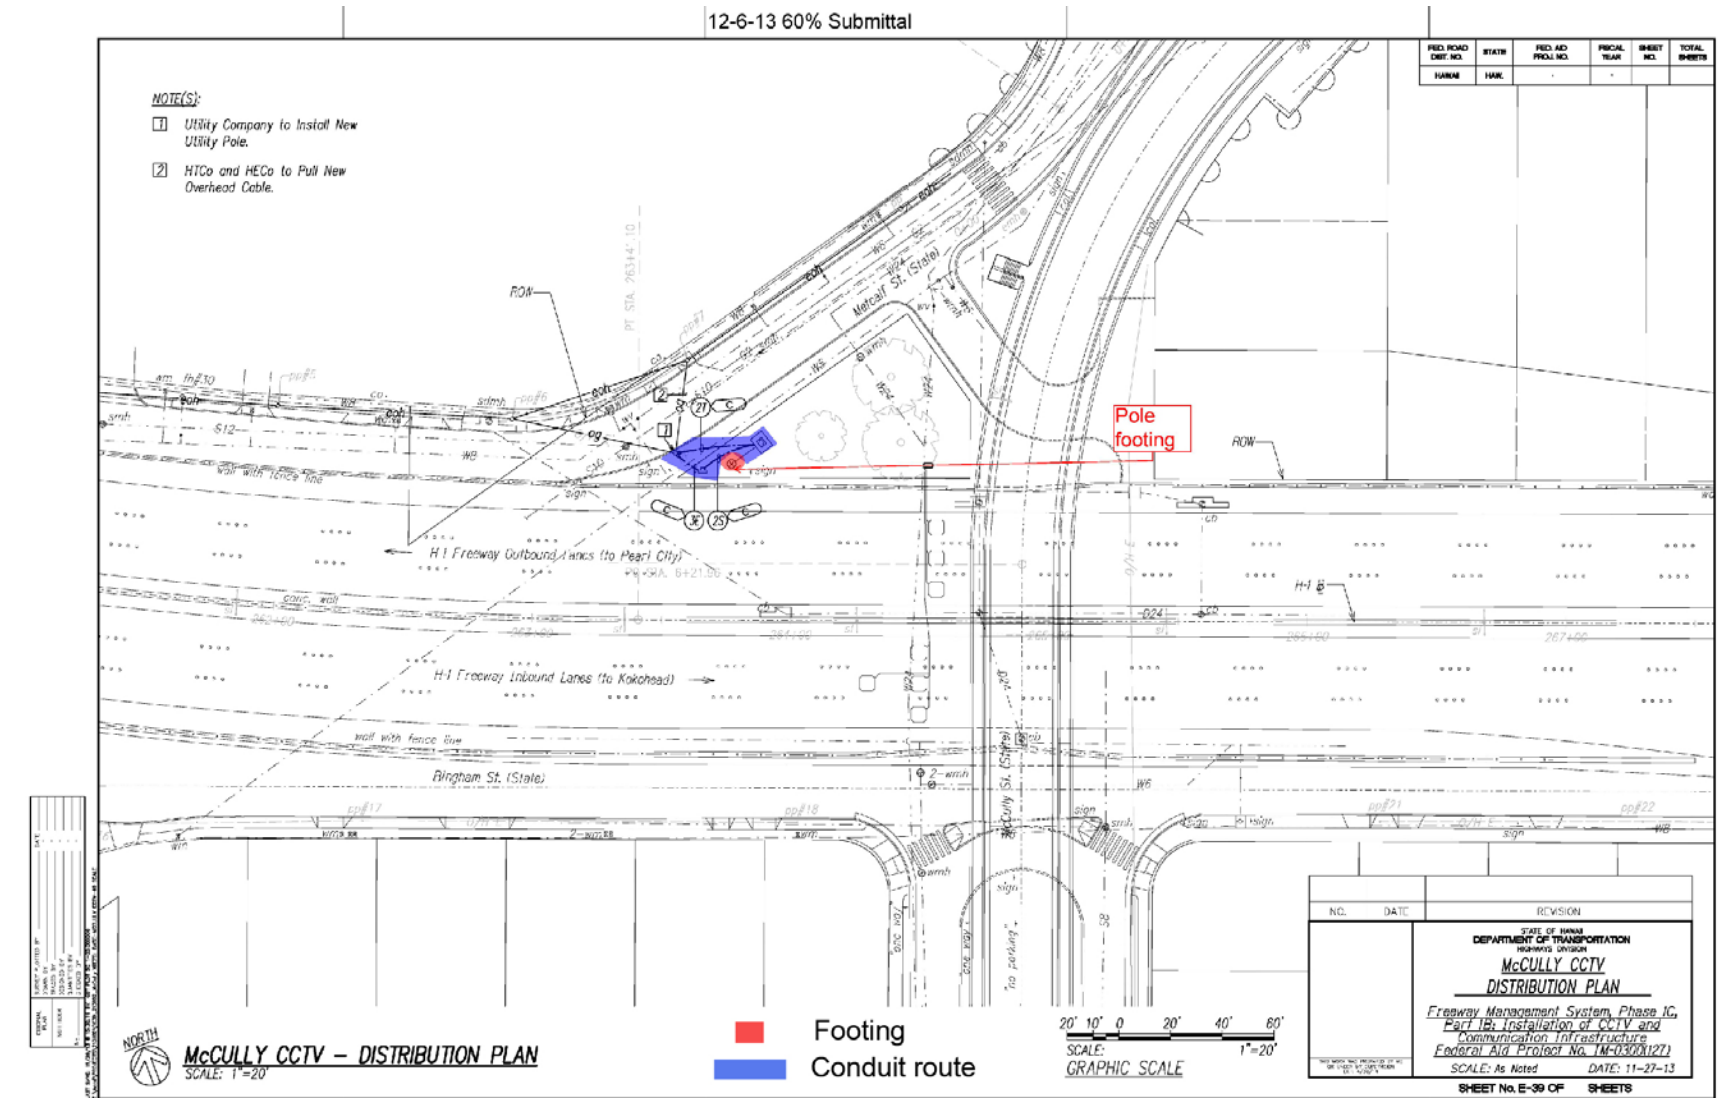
Design Plan for CCTV Installation and Associated Conduit Trenching.
